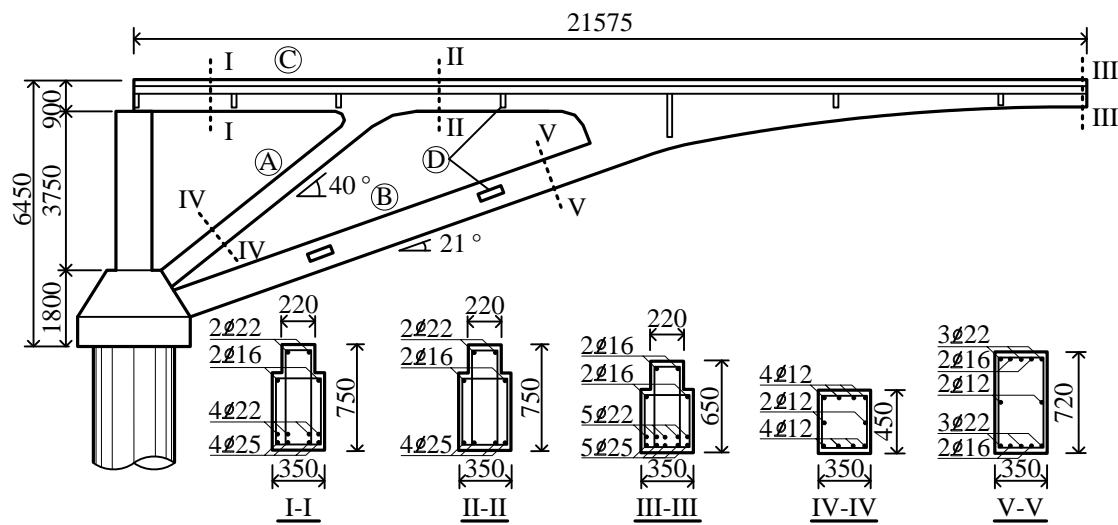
Elevation of half span and reinforcement in cross sections (mm)
